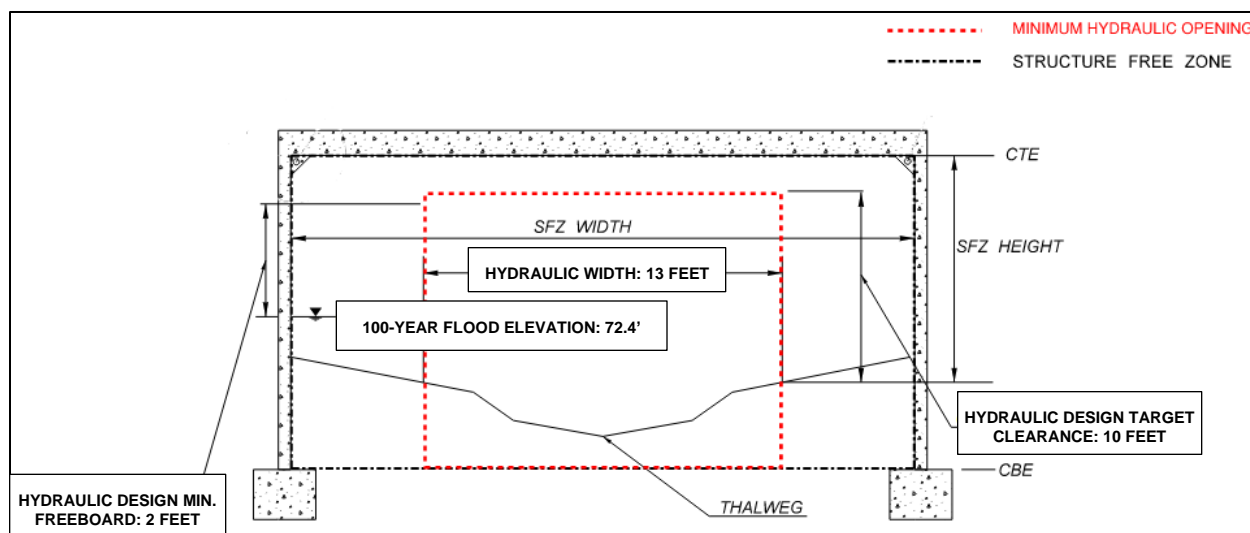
Minimum Hydraulic Opening illustration (Not to scale)
